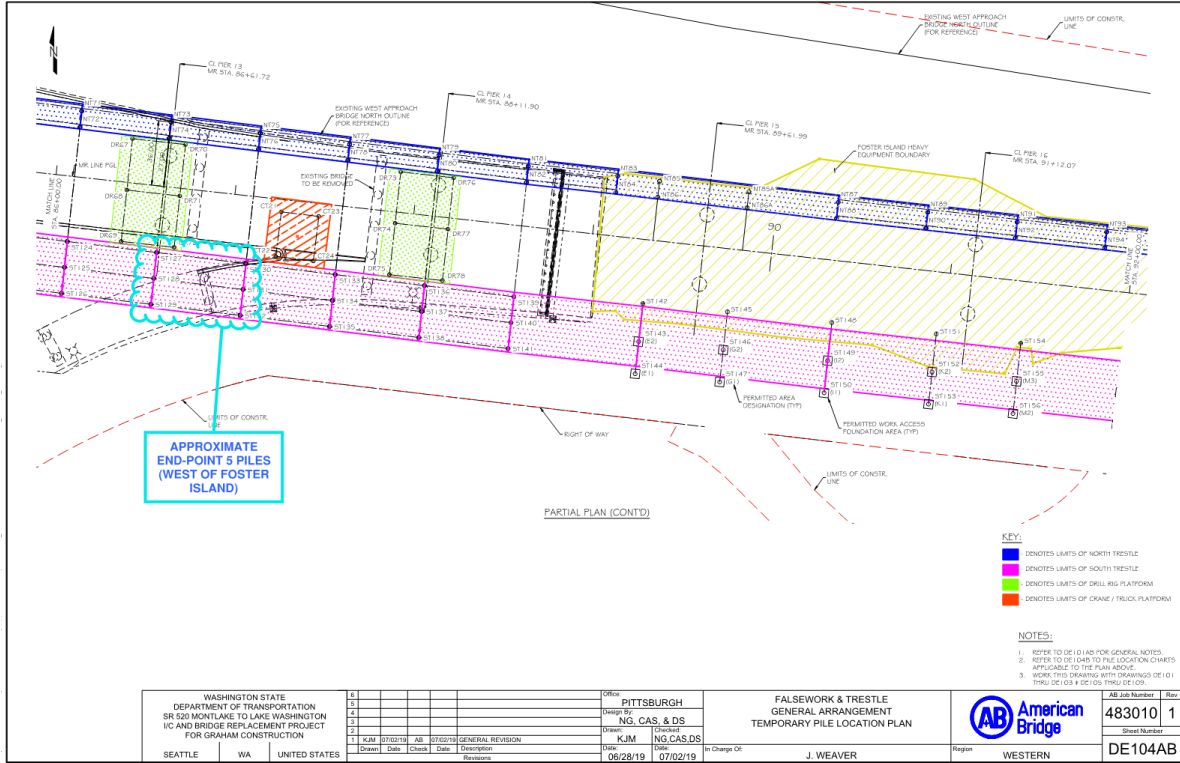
Detail of 5 Endpoint Piles West of Foster Island
